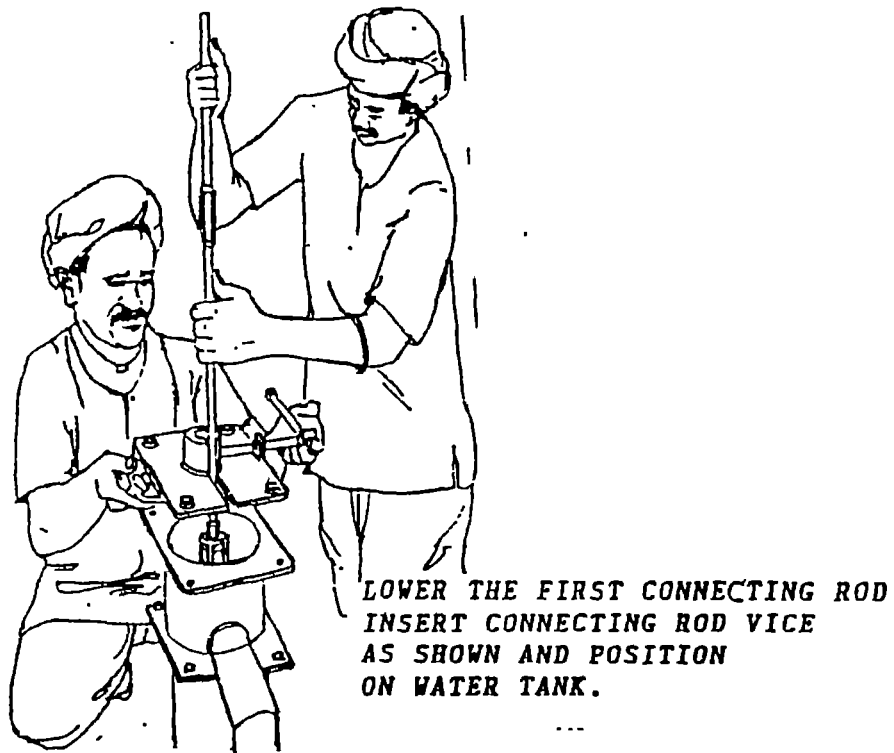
INSERT LOWER END OF THE CONNECTING ROD IN THE RISER PIPE.
